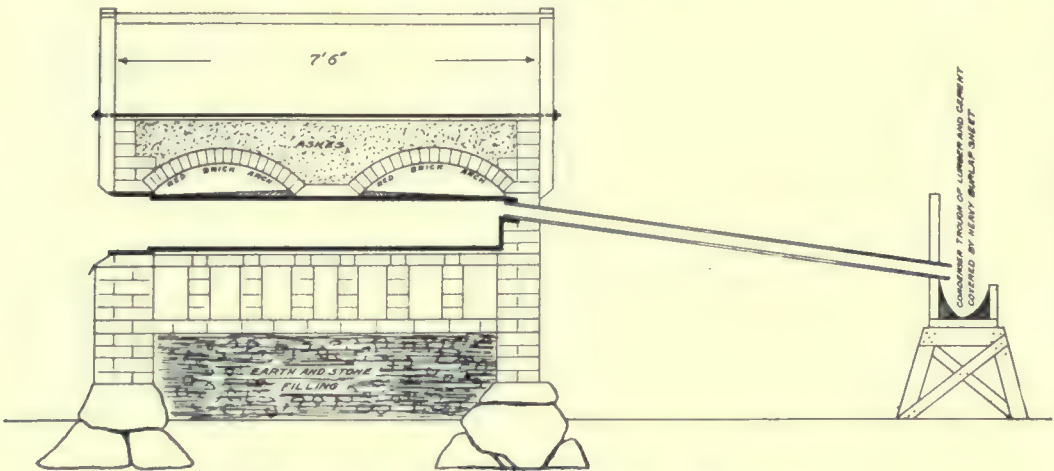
Retort Furnace for Quicksilver Ore. Cross-section.
